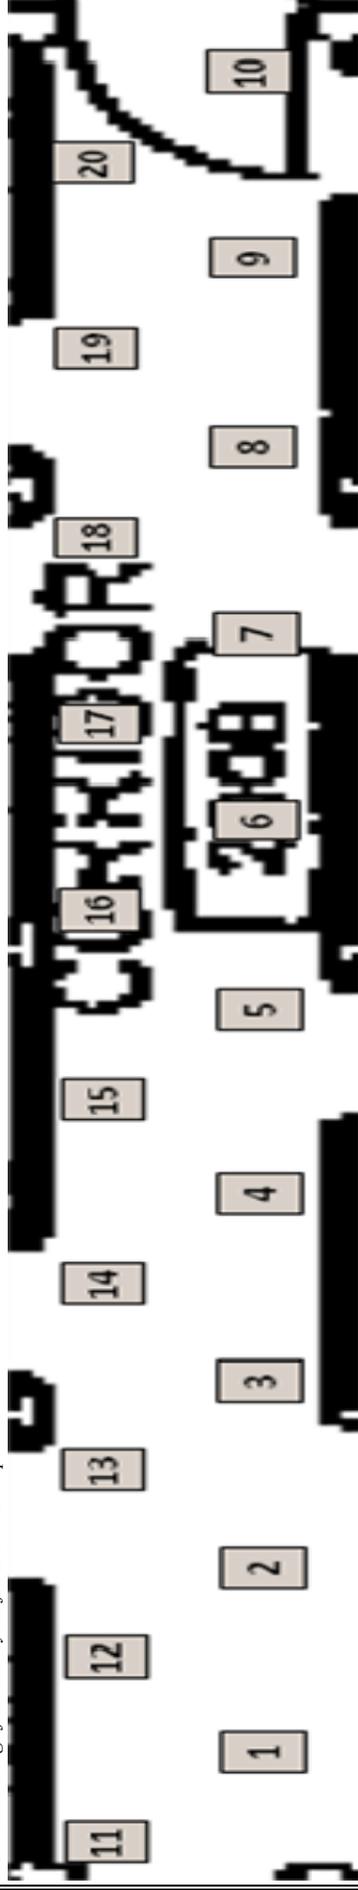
RHODES HALL ROOM 200B FLOORS
